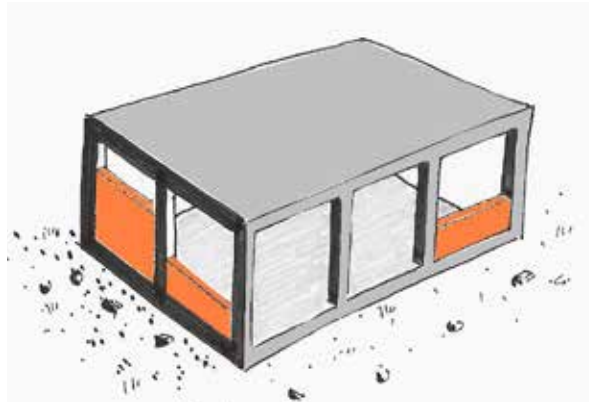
RC frame building with masonry infills (Source: T. Schacher).
